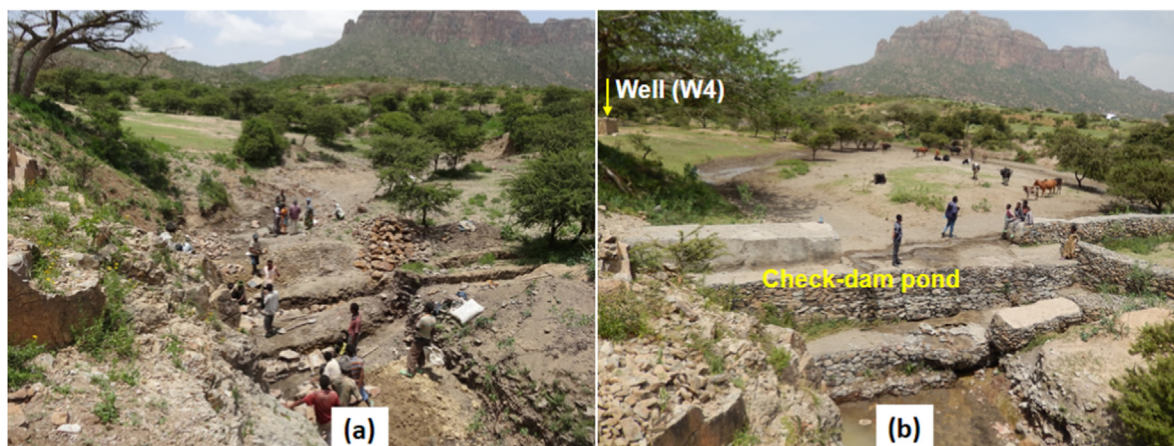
Check-dam pond constructed in 2014 to store surface water: (a) during construction (cut-off trench excavation), and (b) after construction (silted-up) and acting as sand dam.
